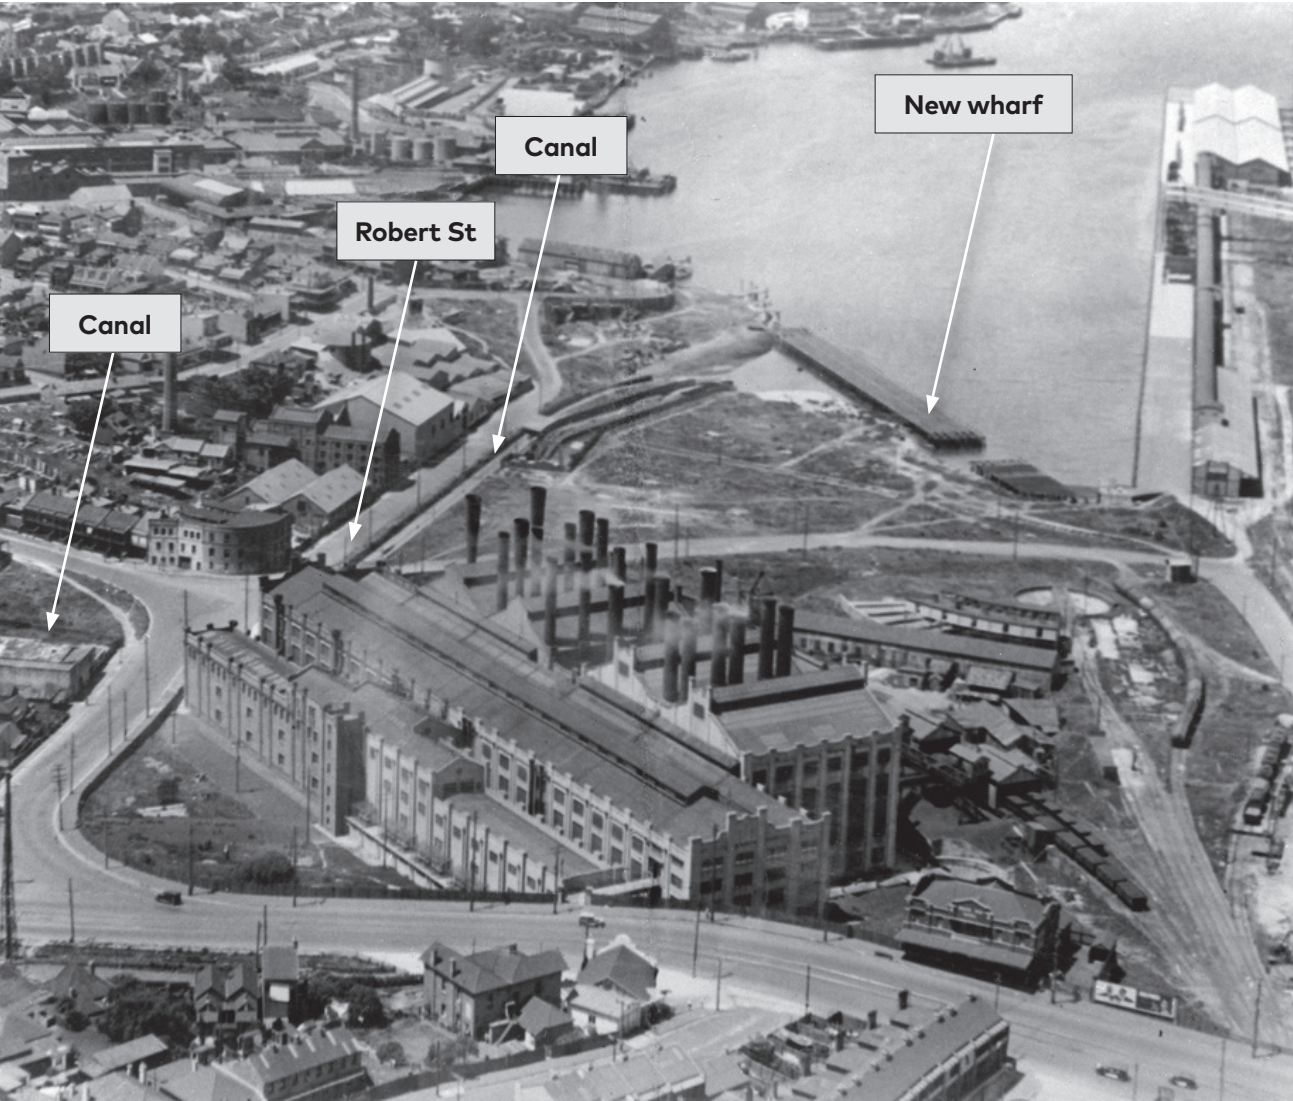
1930s view of White Bay Power Station showing the construction of new wharfs, location of stormwater canal and reclaimed land south of Robert Street.
